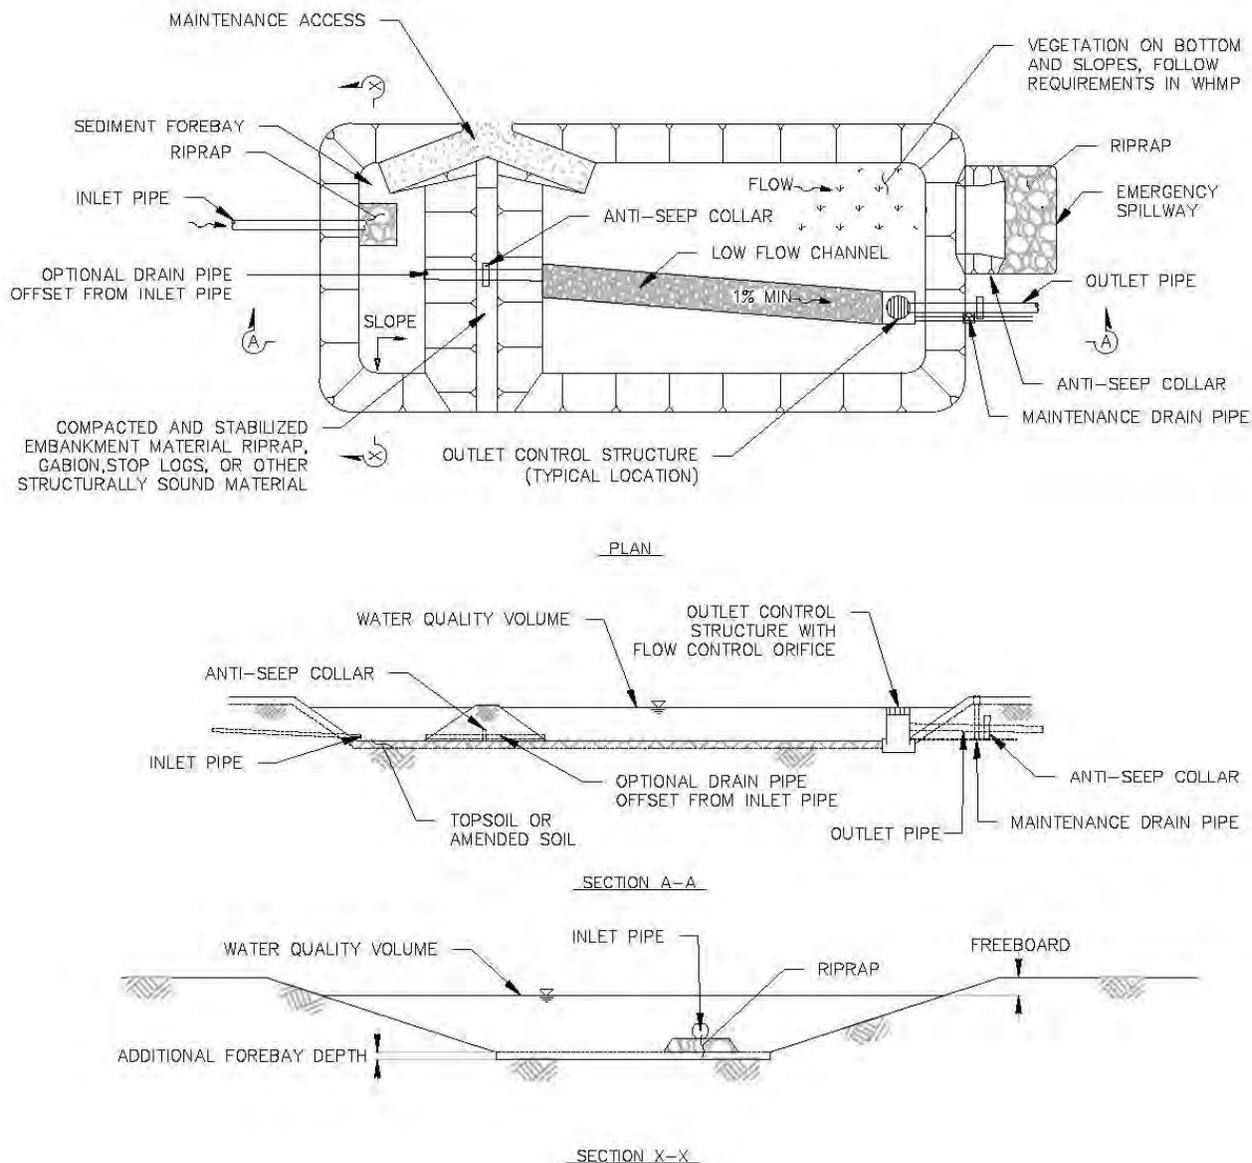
Dry Extended Detention Basin Schematic Plan and Section Views
